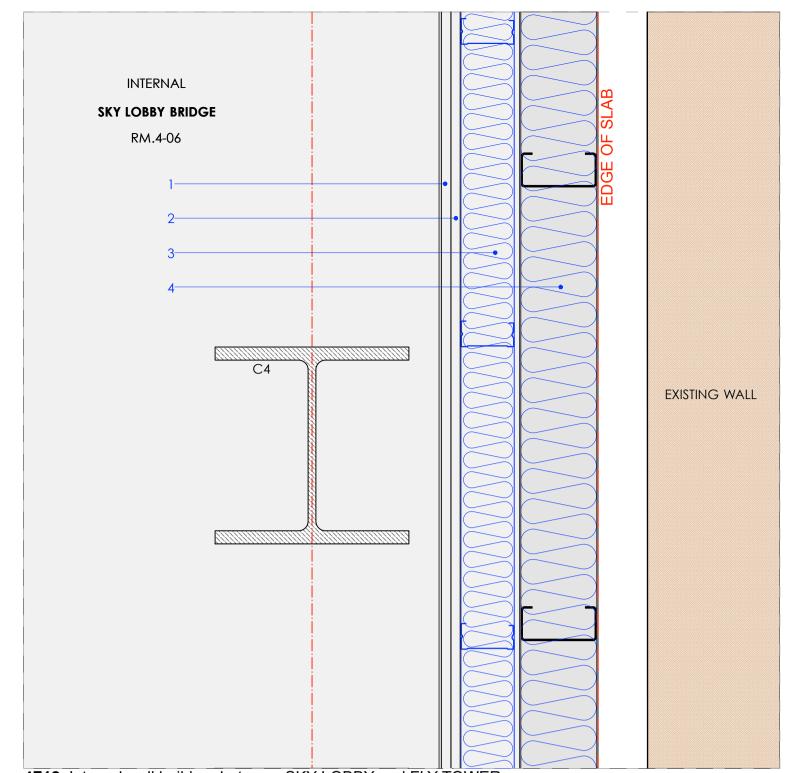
F10 part of external wall details AHA-KKC-DET-814-1
